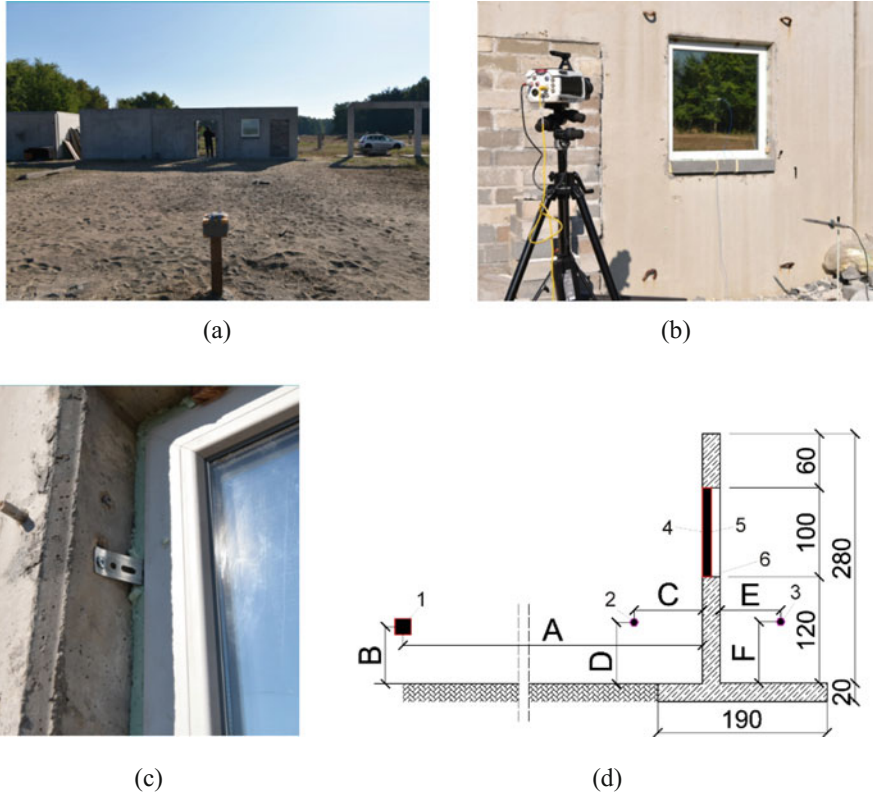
Experimental setup: (a) frontal view, (b) rear side; (c) frame connection detail and (d) schematic setup (lateral view, dimensions in cm)
